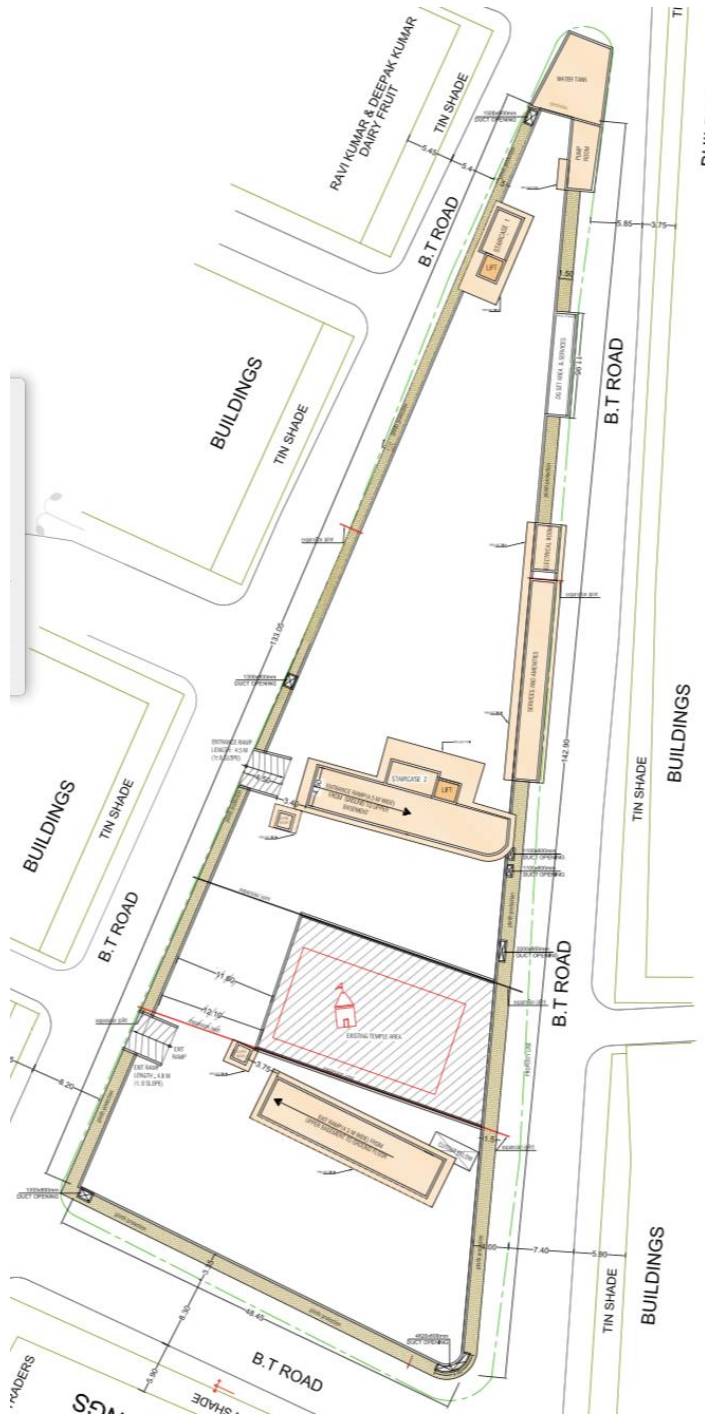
Site plan for parking at Anaj Mandi. The existing temple on site has been retained, Source- Eptisa
